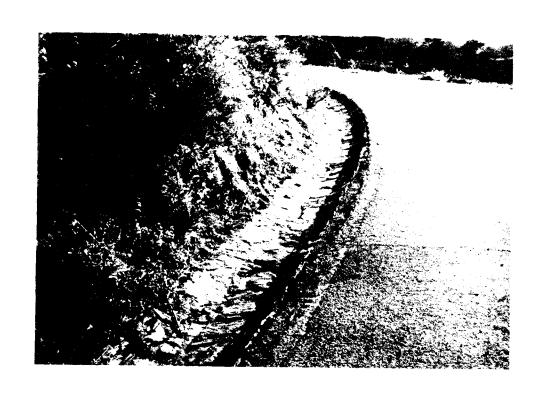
Masonry stone foundation wall for Tunnel Rock on upslope side of highway (13.9 miles below Giant Forest Market)
